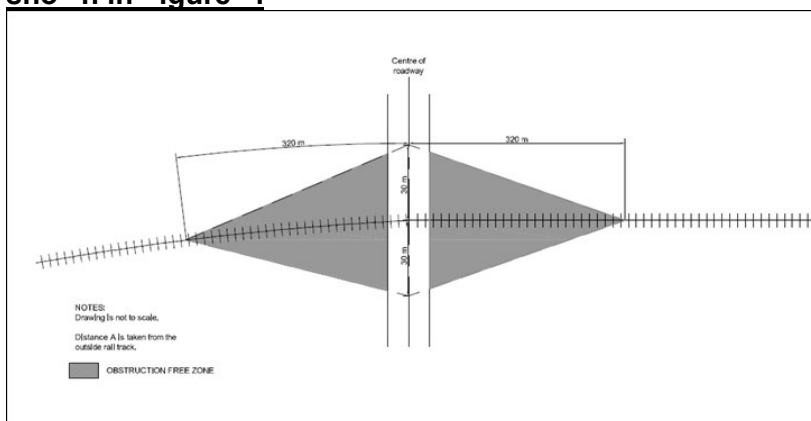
Approach Sight Triangles for Level Crossings with “Give Way” Signs
